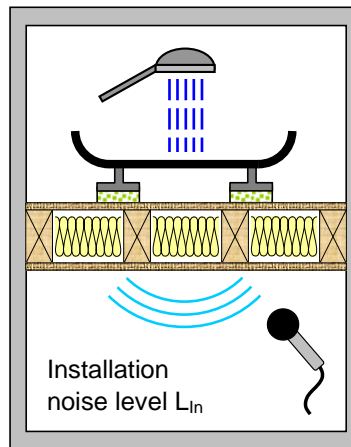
Measurement setup to determine the installation noise level of water installations using a shower tray placed on an timber ceiling as example.
